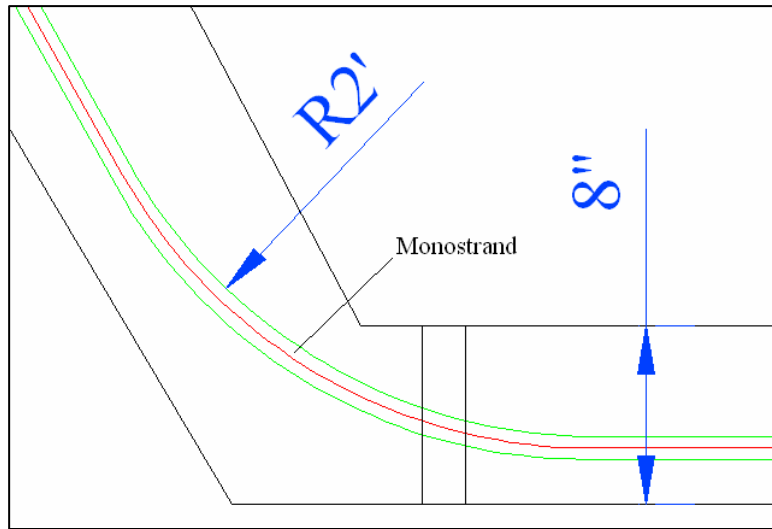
Mid-Bay Bridge Segmental Box Girder Corner Section with Monostrand
